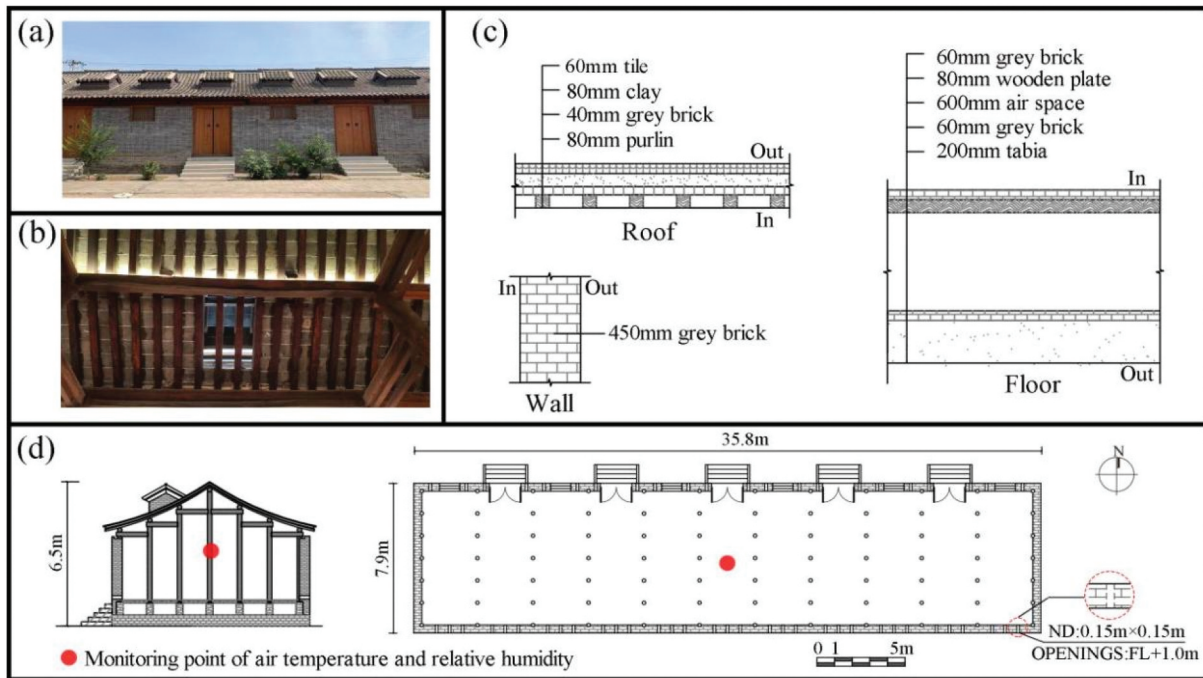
Architectural features of Yingyi charitable granary: (a) Picture of the south facade; (b) Picture of the construction of inner roof; (c) Construction of envelope, and (d) Section plan and layout plan.
